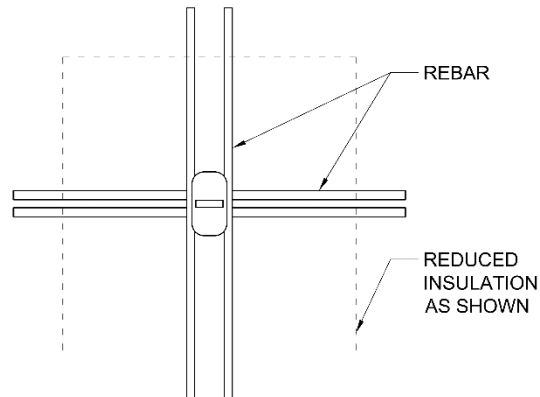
Plan view of common lifting anchor detail showing decreased insulation around lifting anchor
